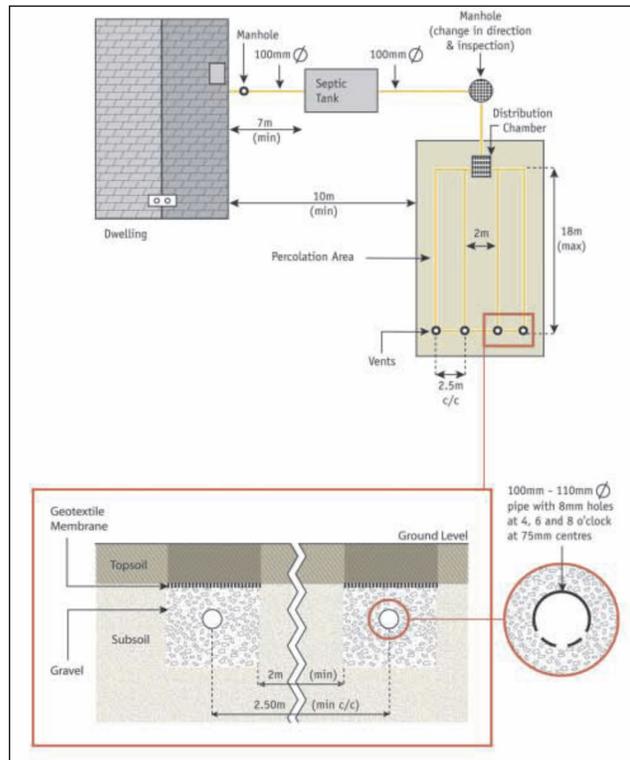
Plan and Section of Layout of a Typical Septic Tank System¹⁰
